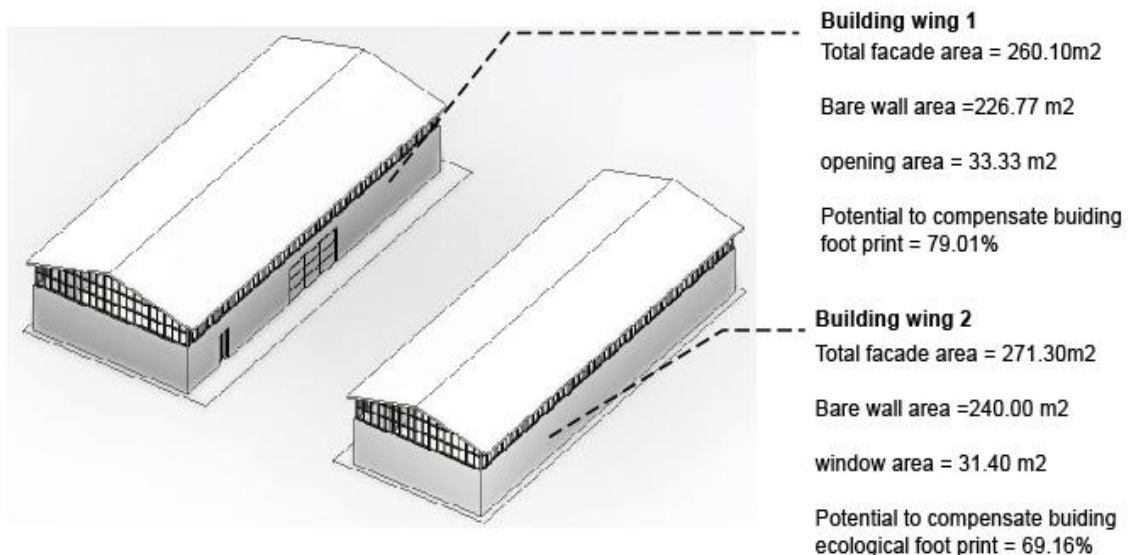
External surfaces bare wall potentials of Workshop buildings,
